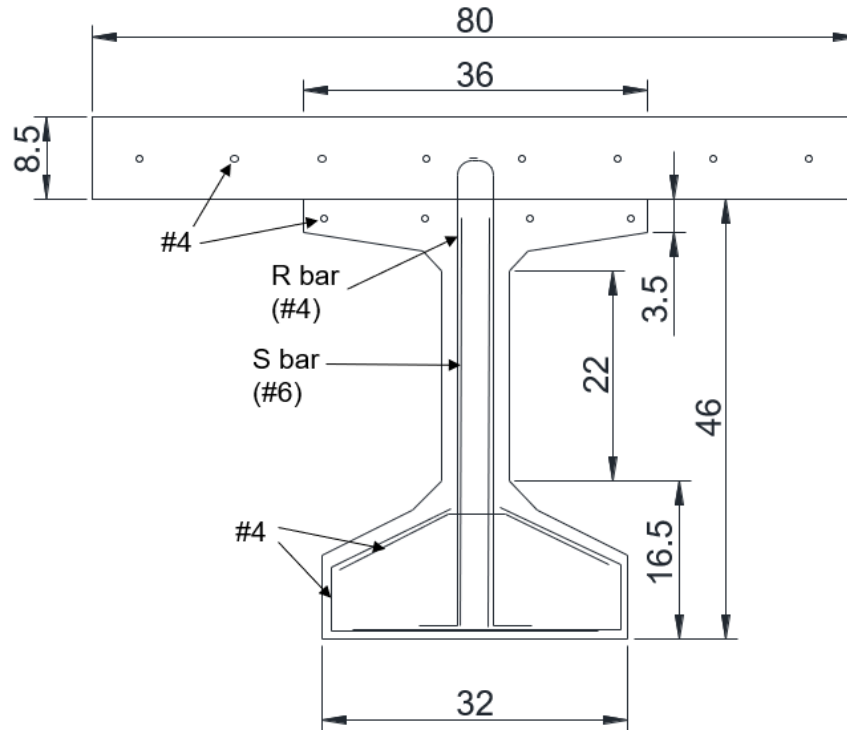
The cross-section geometry and reinforcement detail for Tx-46 and 8.5-in. height deck
